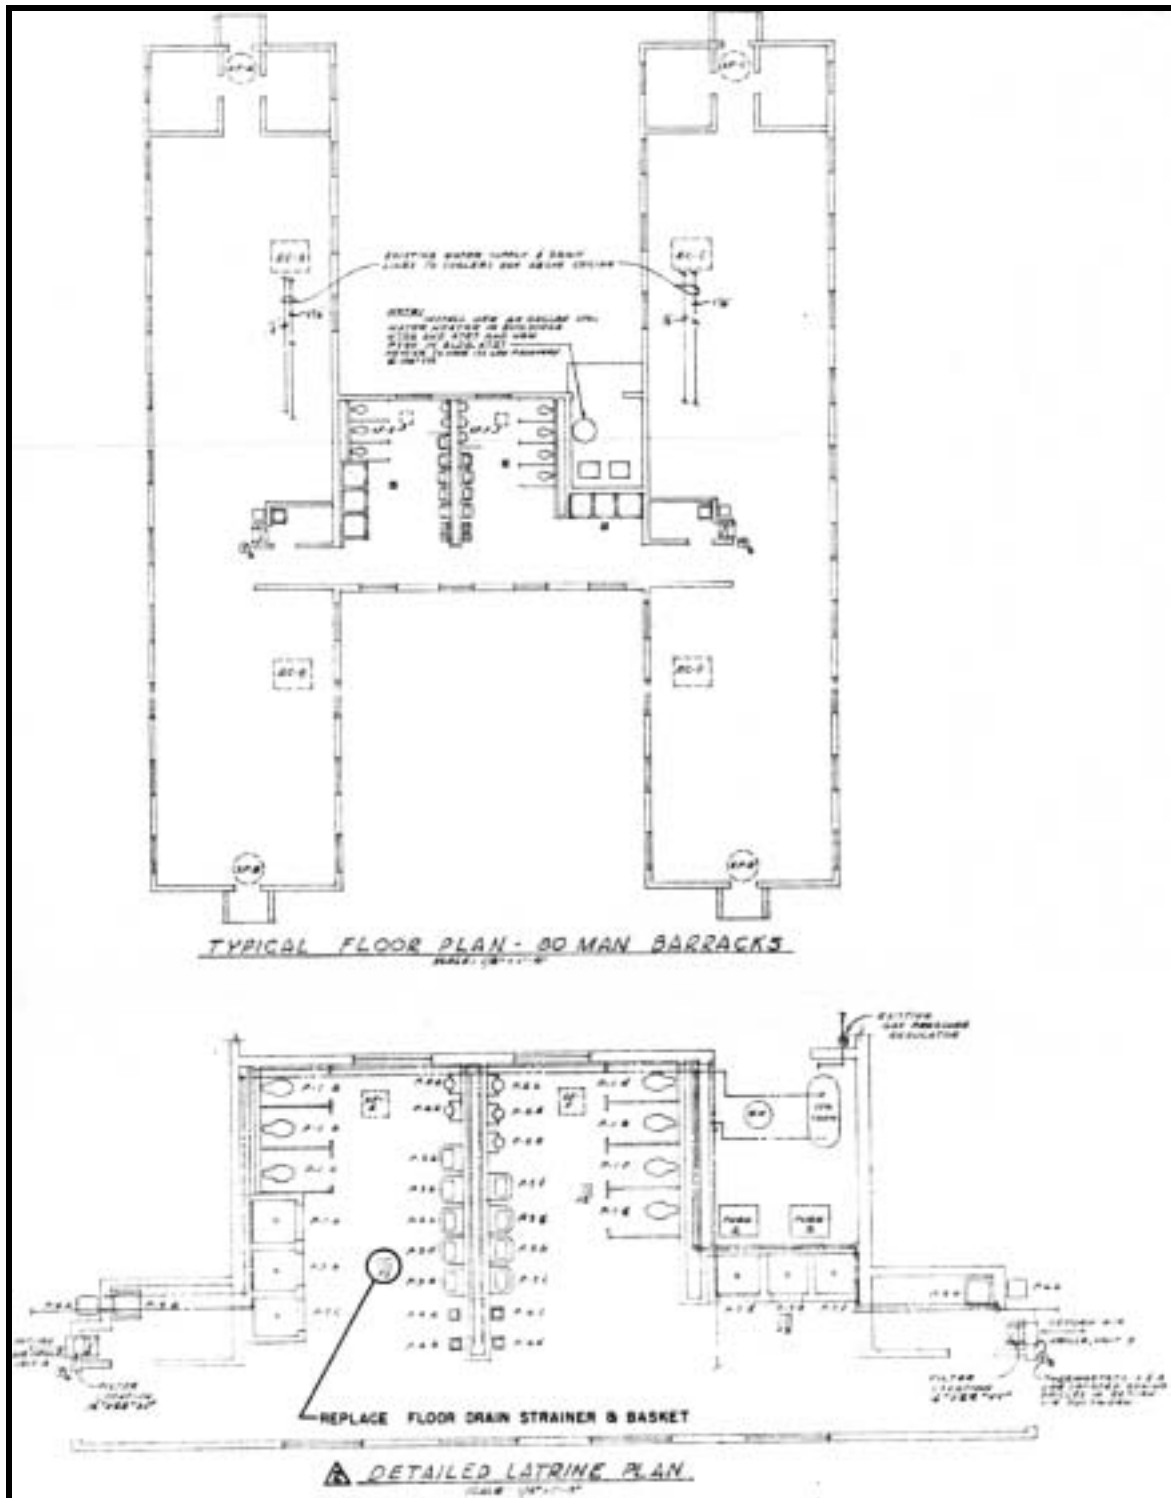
Semi-permanent 80-man “H” barracks, floor plan, Ft. Bliss (1974, revised 1976) (Engineering, Ft. Bliss).
